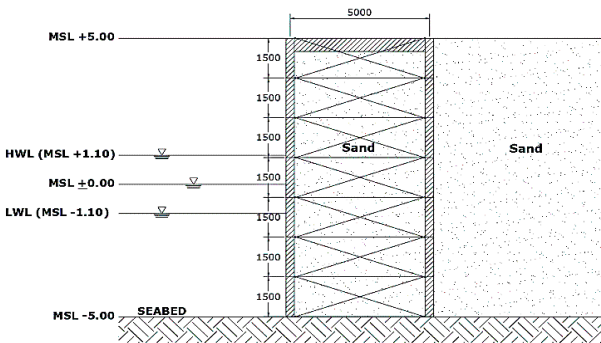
Parallel concrete panel cross-section with diagonal tie rod configuration (Type A)
